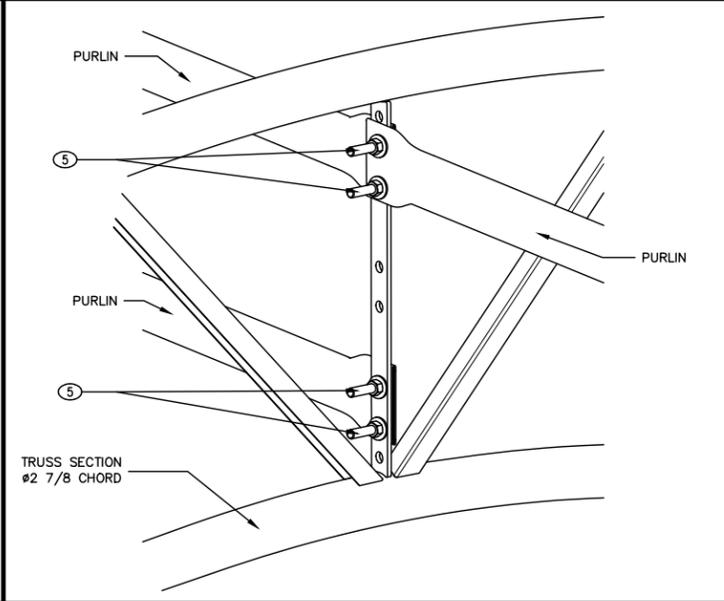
STEEL LEG MOUNT - GRIDS 2-6
